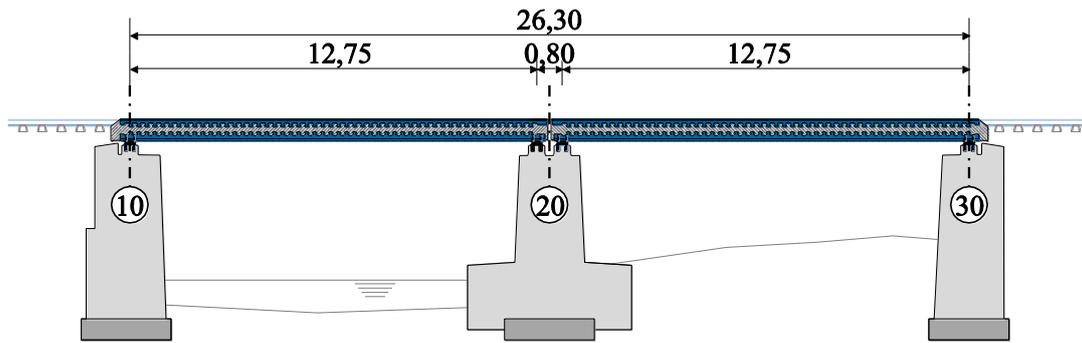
Longitudinal section railway crossing over the river "Simmerbach" with two VFT-Rail® girders, placed on toughened sub-structure
